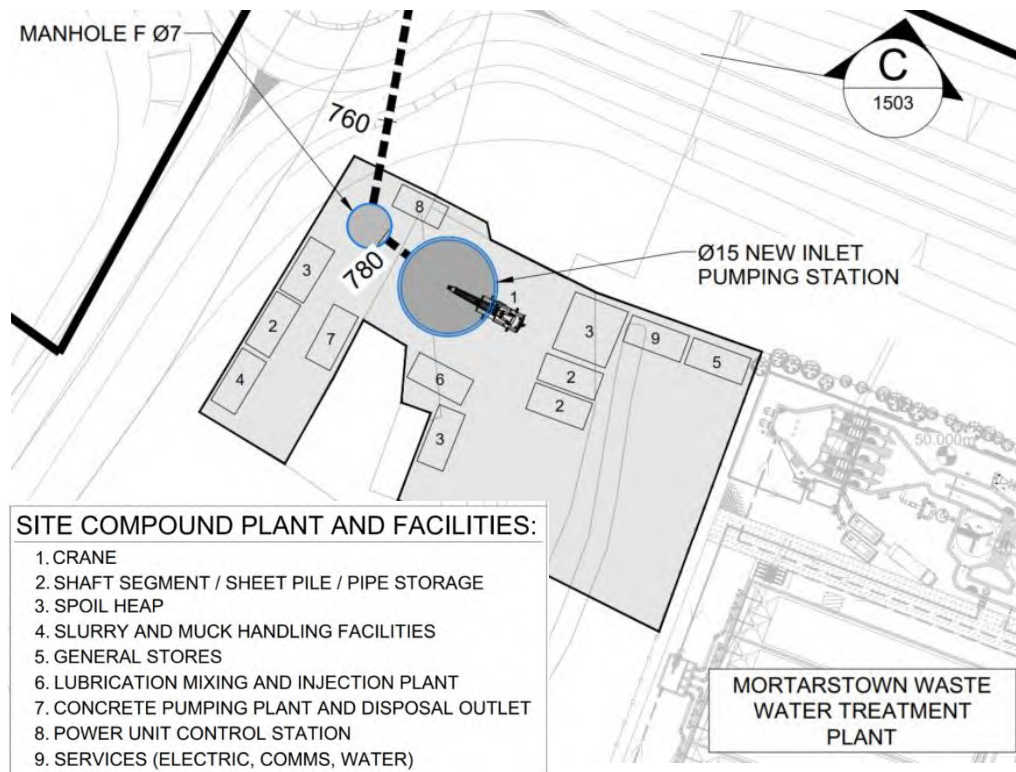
Indicative plan arrangement at the new inlet PS / Shaft F site
